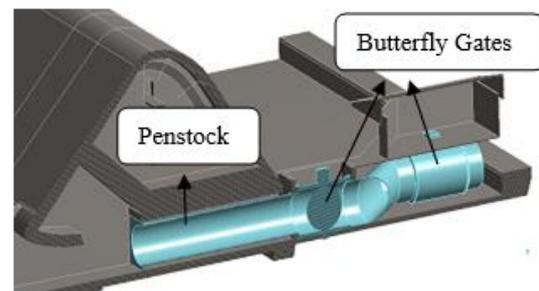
Locations of the butterfly gates of the bottom outlet section.
